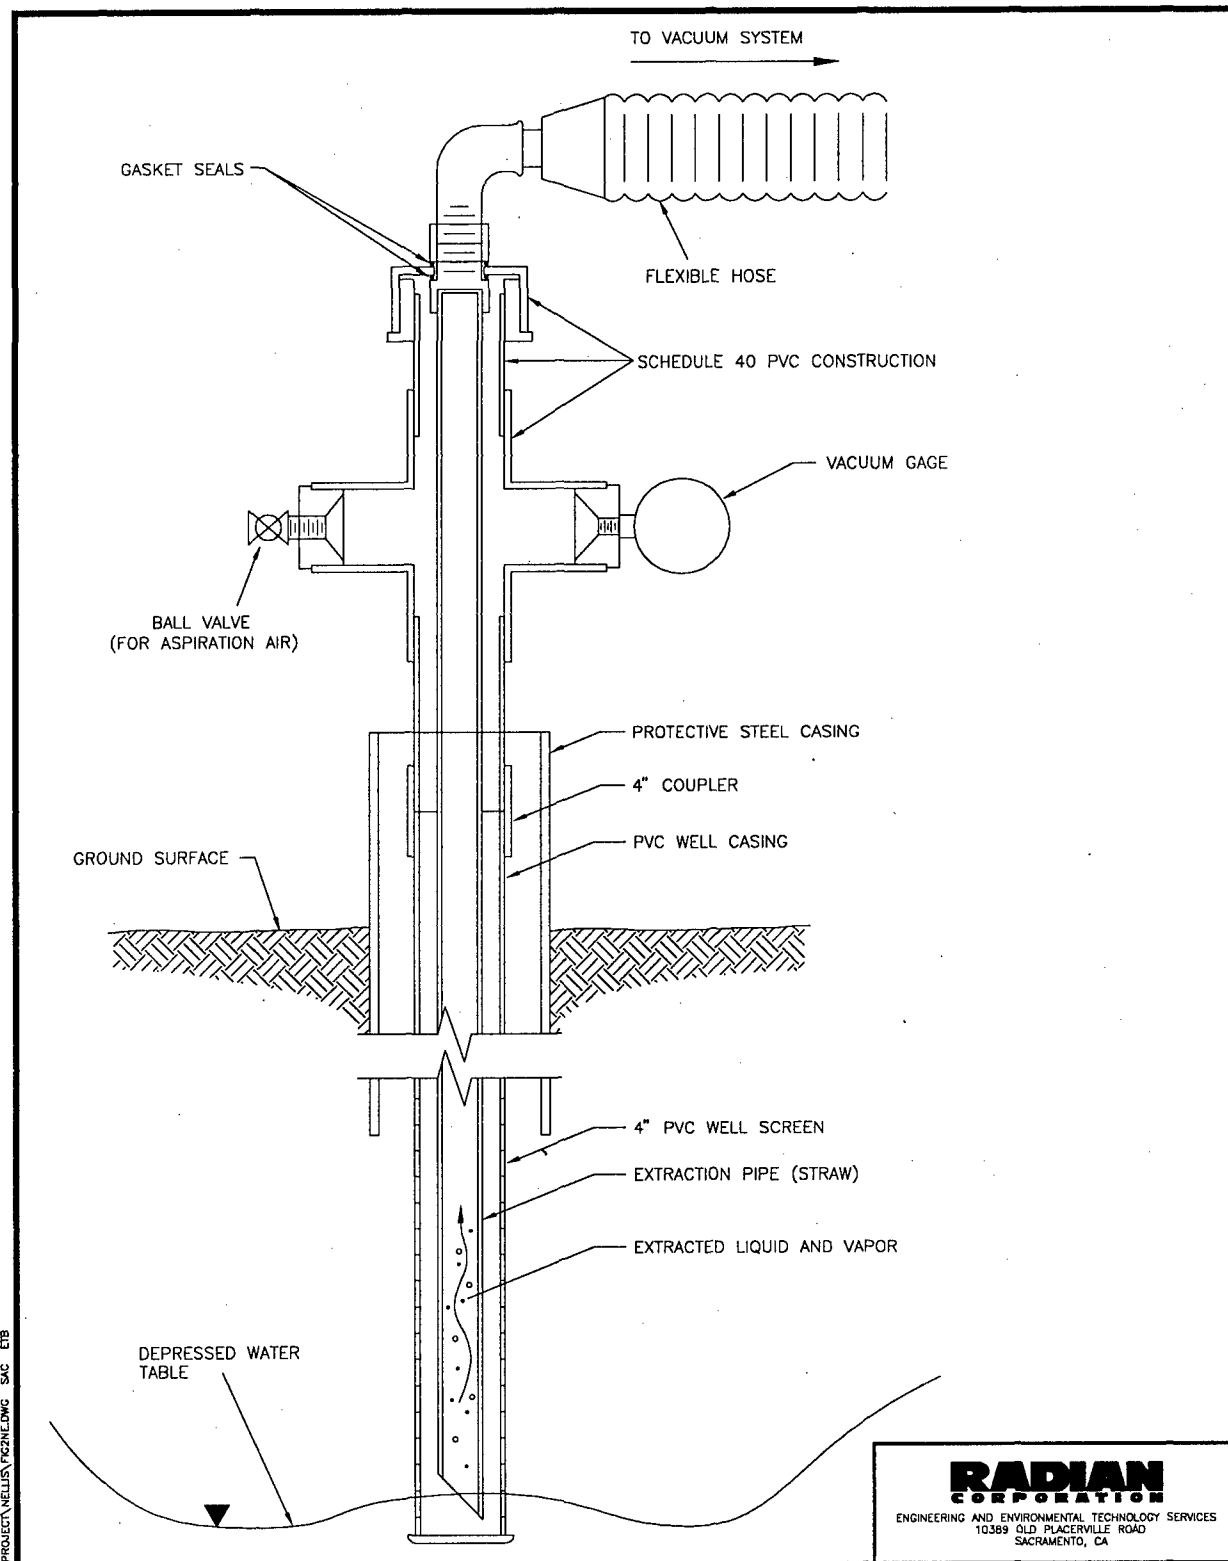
Two-Phase Wellhead Assembly and Extraction Well
